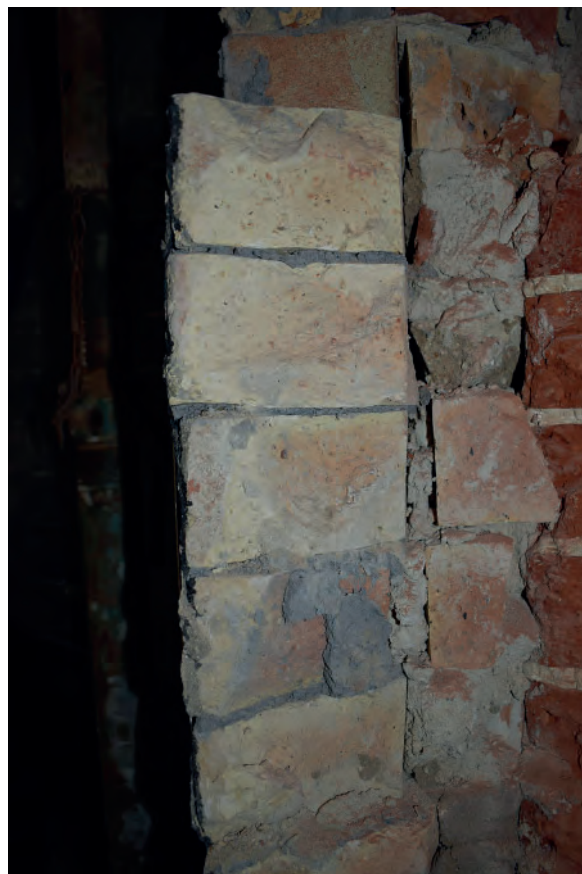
North wall, east fireplace, exemplar of brick from 1920s fireplace
